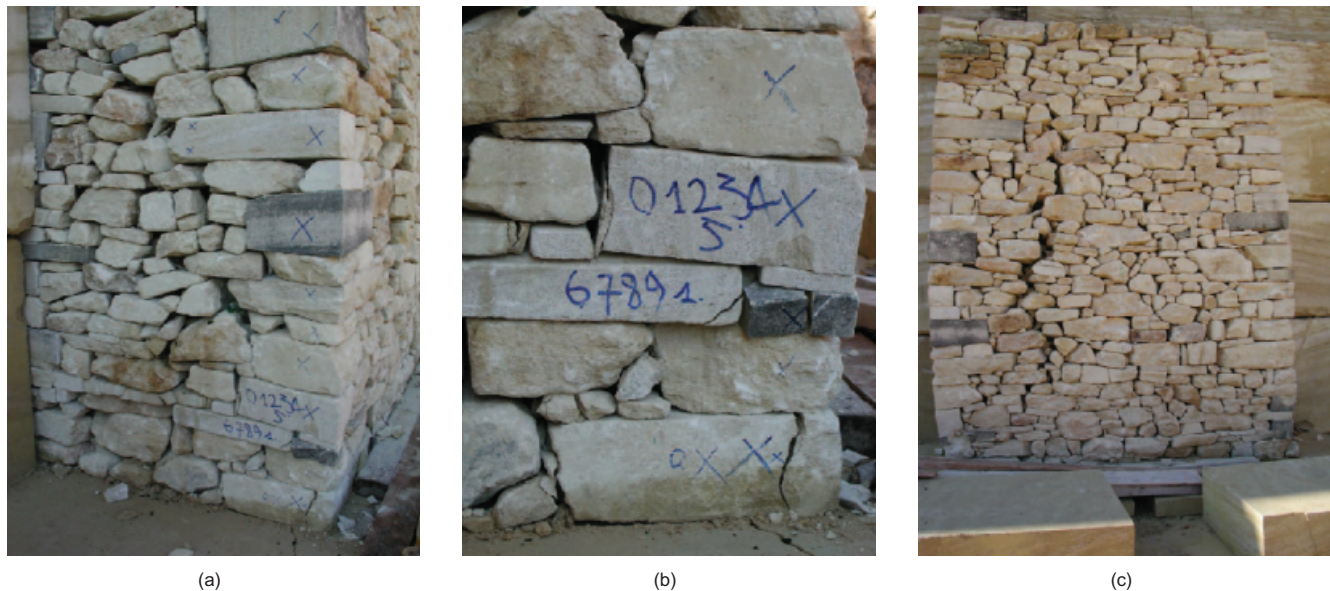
(a) Wall V31 ‘opening’ due to (b) foundation failure, and (c) right-angle quoins spread
